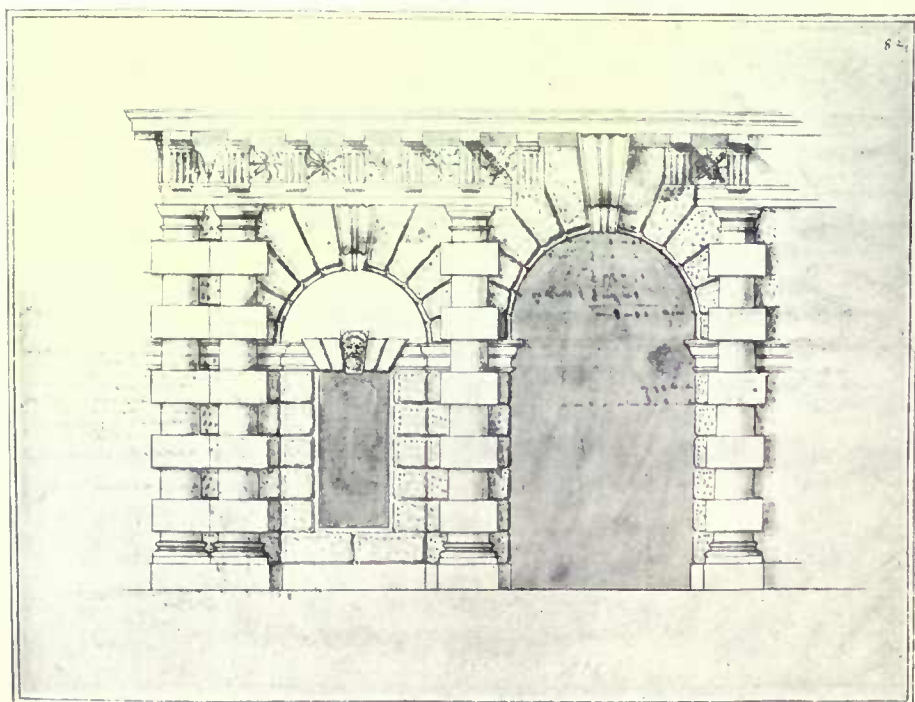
DETAIL OF THE GROUND-FLOOR STOREY OF A CORNER PAVILION OF THE EAST ELEVATION, FIG. 7
